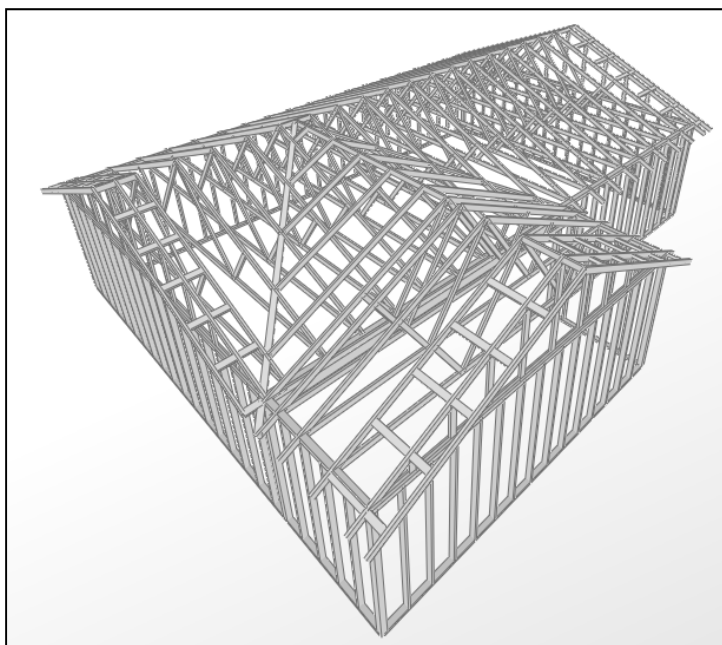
L-Shaped Index Building for Uplift Investigation – L-Shaped building with no openings, no interior walls and no GWB. Walls and gable-ends are fully sheathed on the exterior with plywood.
